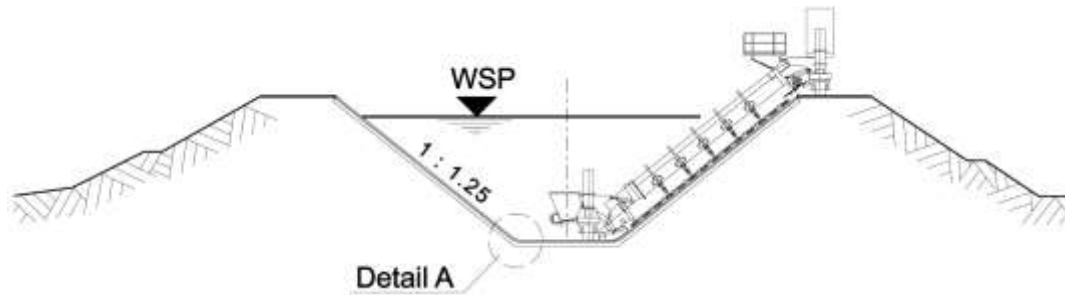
Power plant canal, cross-section with bridge paver (DGGT, 2008)
